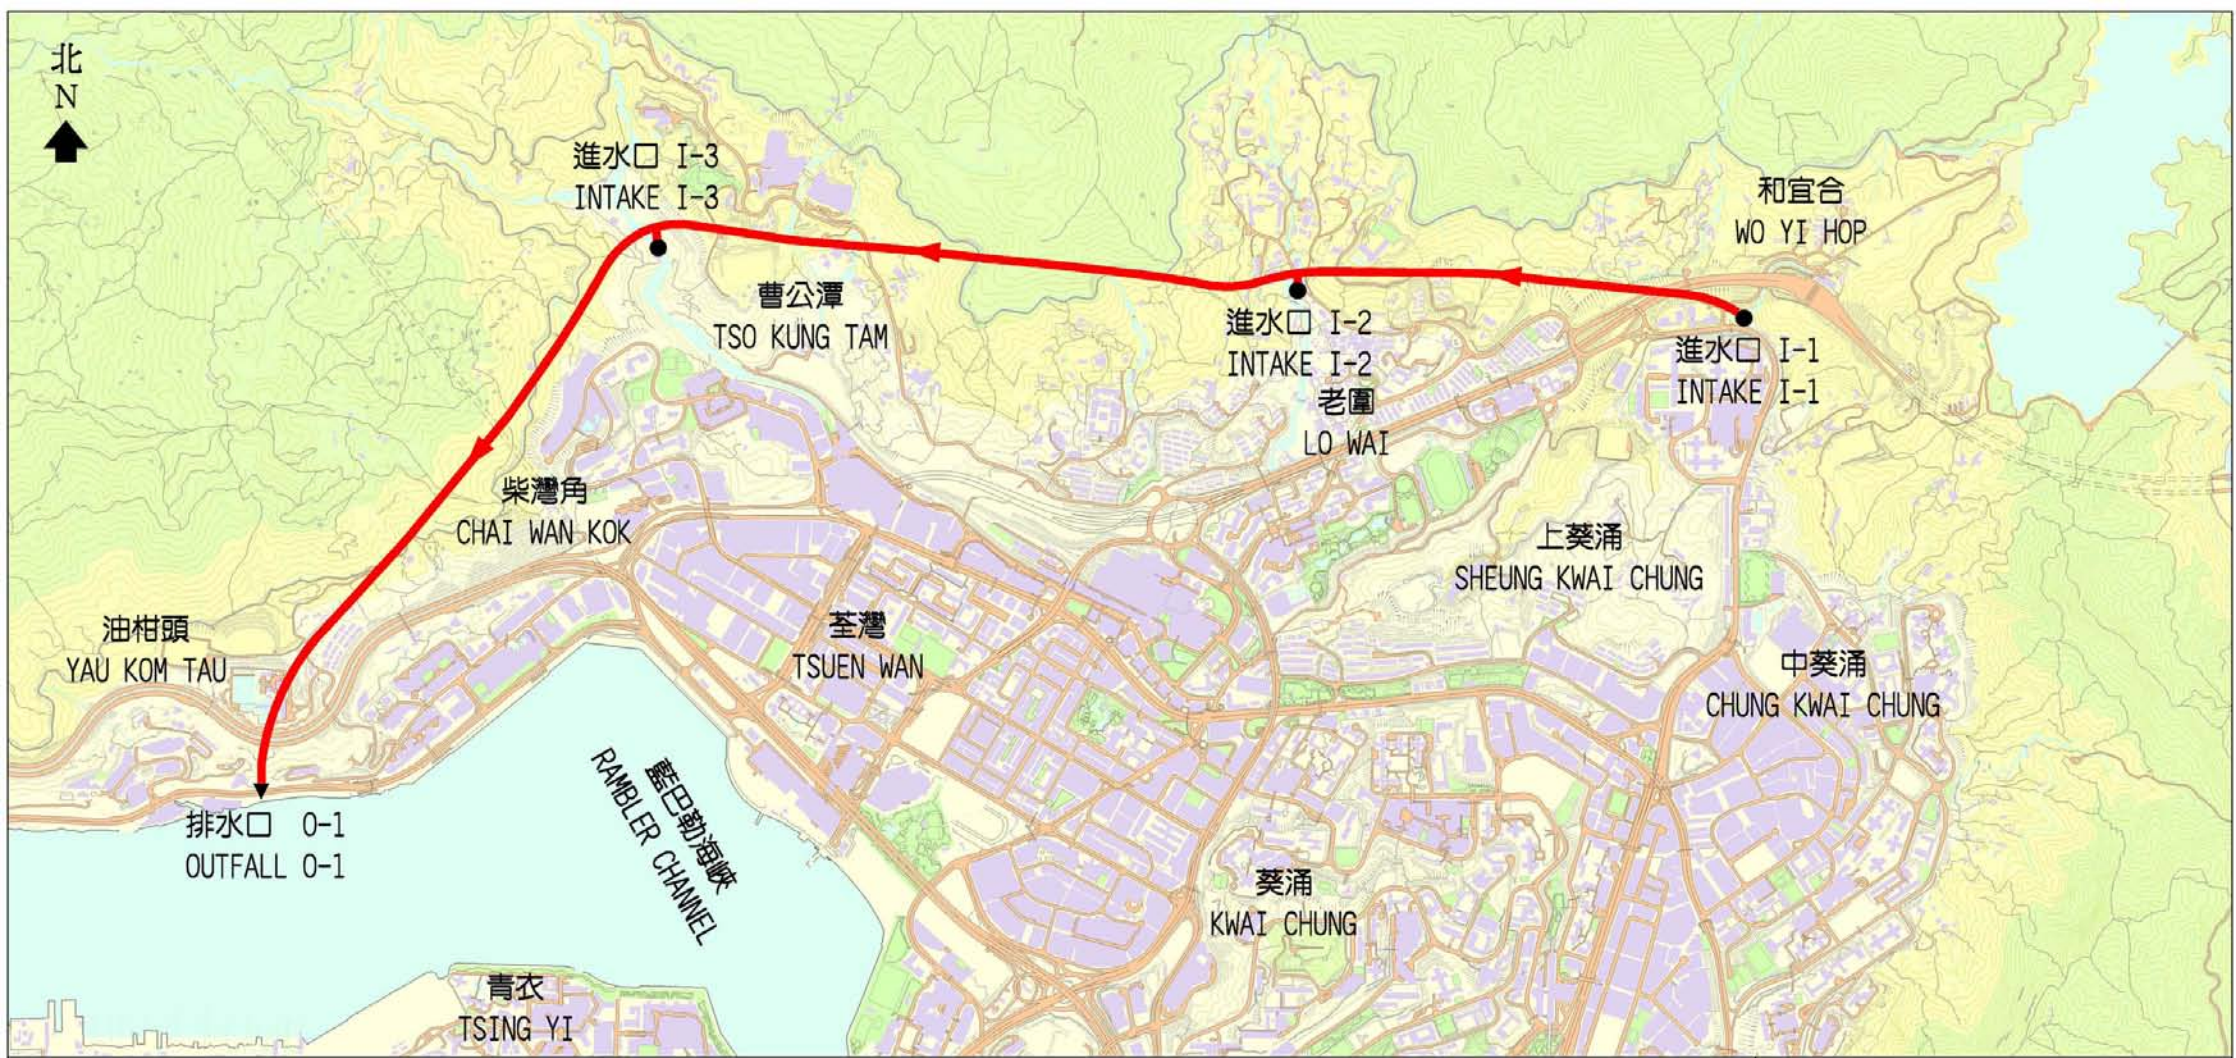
Location Plan of Tsuen Wan Drainage Tunnel
